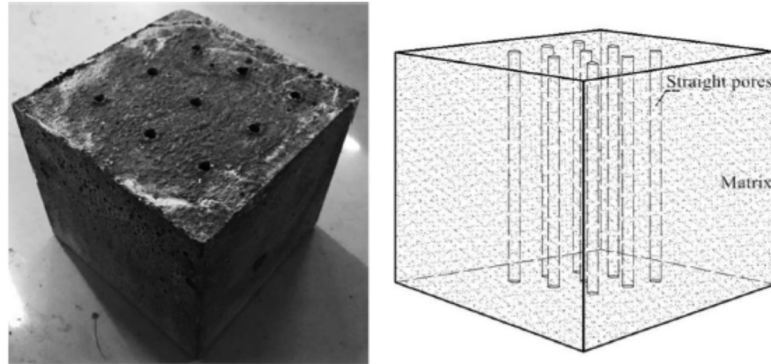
High Strength pervious Concrete Specimen and Schematics [32]
